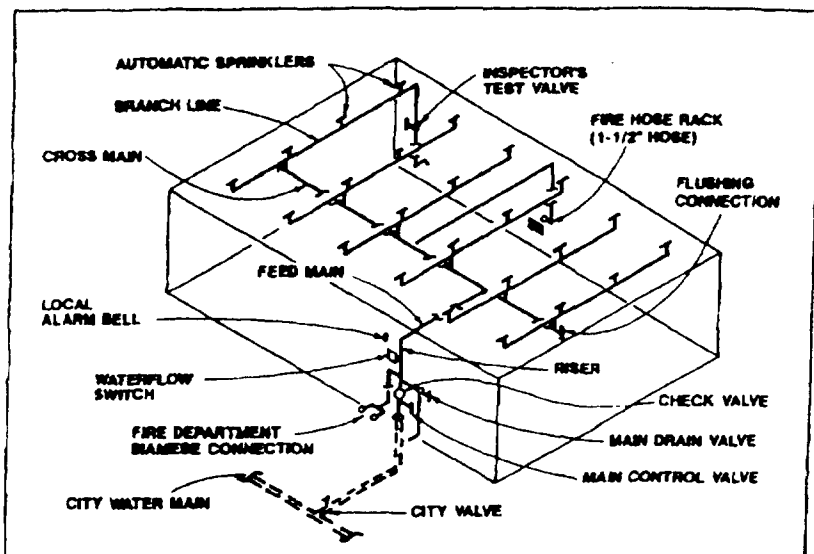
Arrangement of elements found in a typical sprinkler system.
